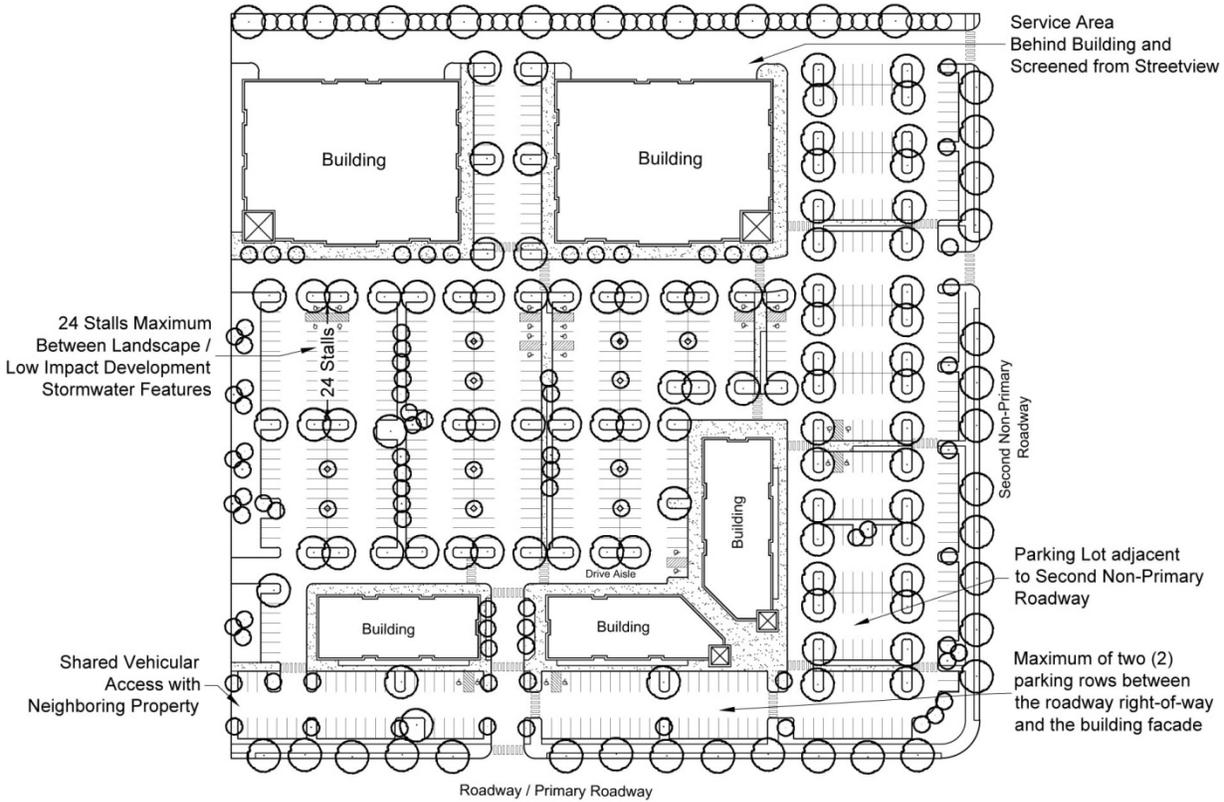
(c).1 – Site Layout - Parking Standards
